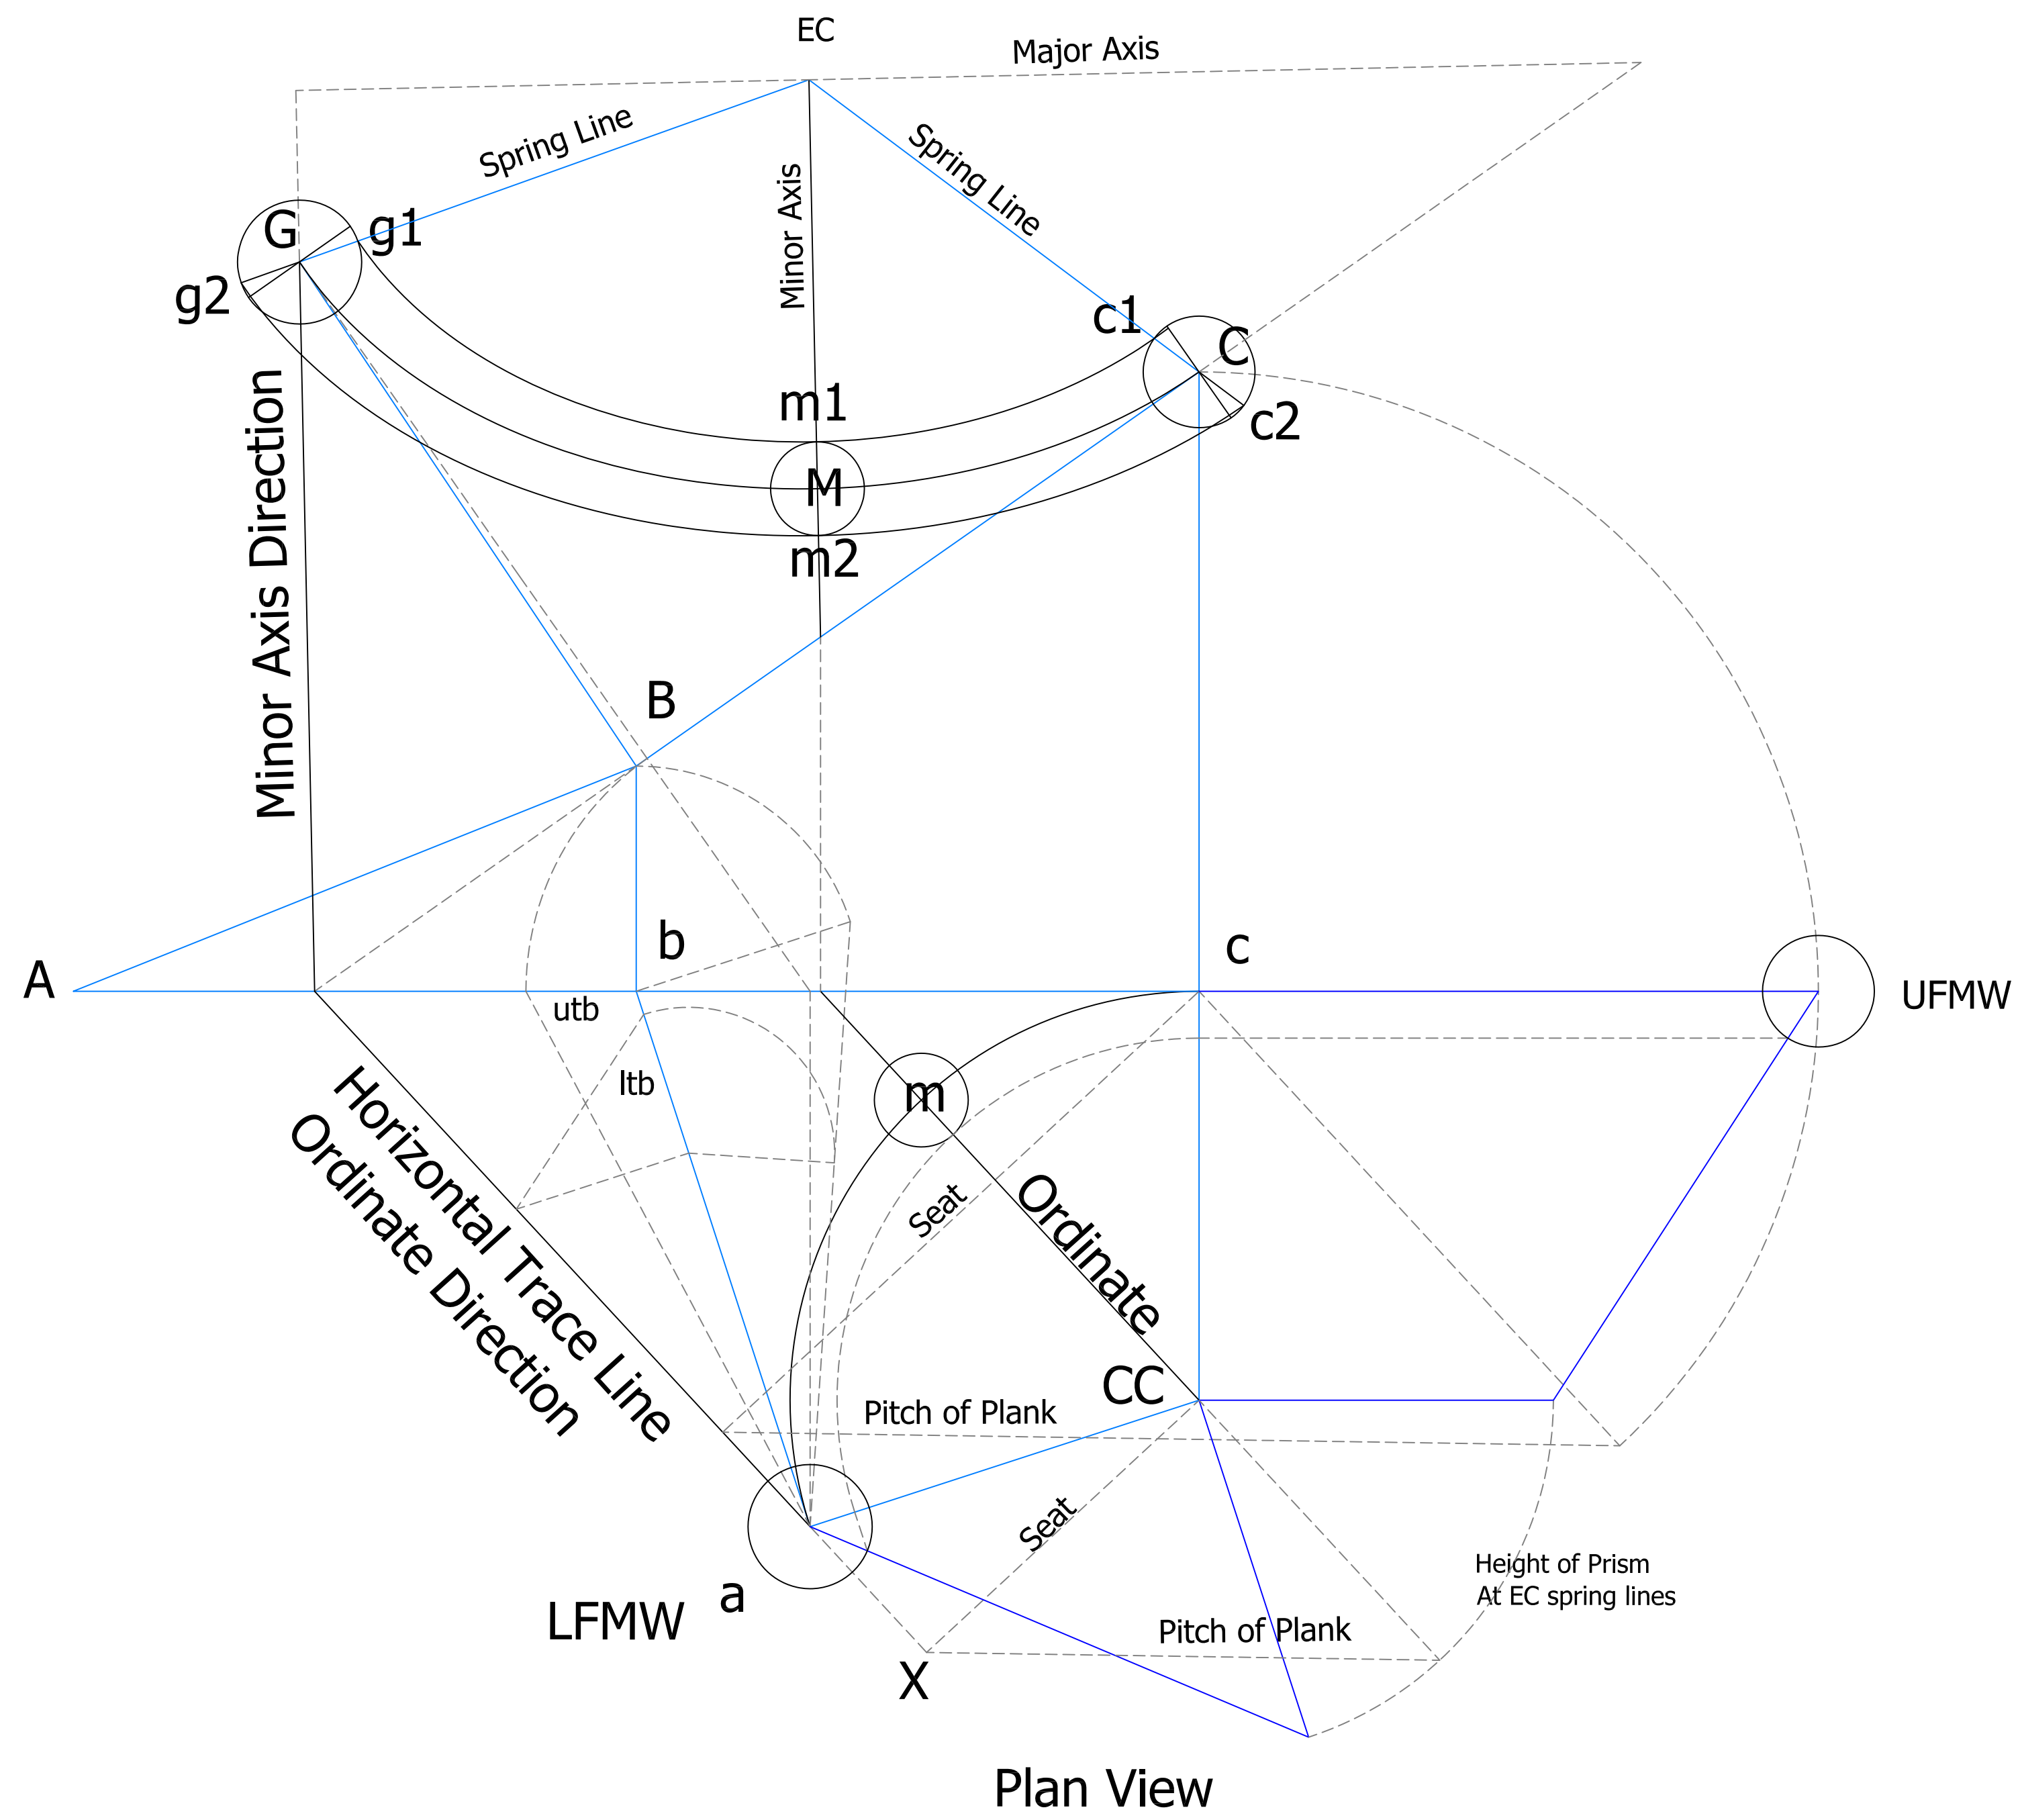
Plan Acute with Short Upper Tangent Pitched
